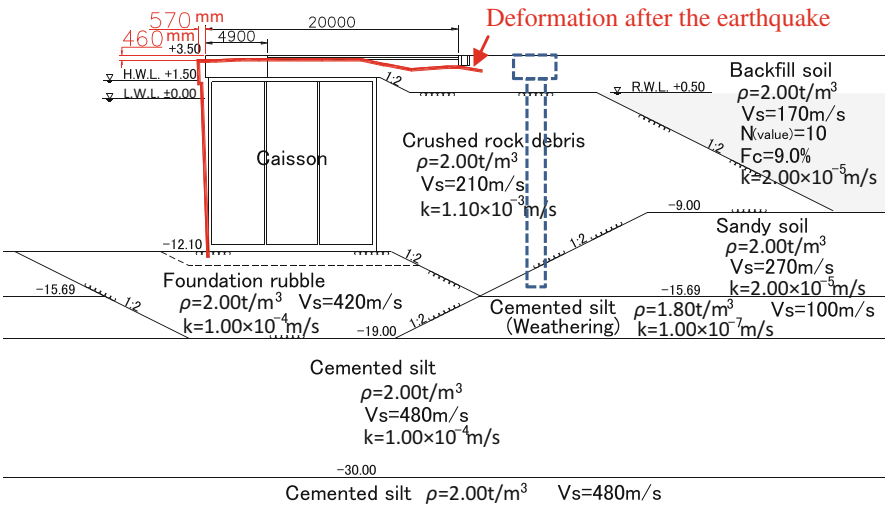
Cross sections and deformations of the quay wall at No.5-wharf in Onahama port
